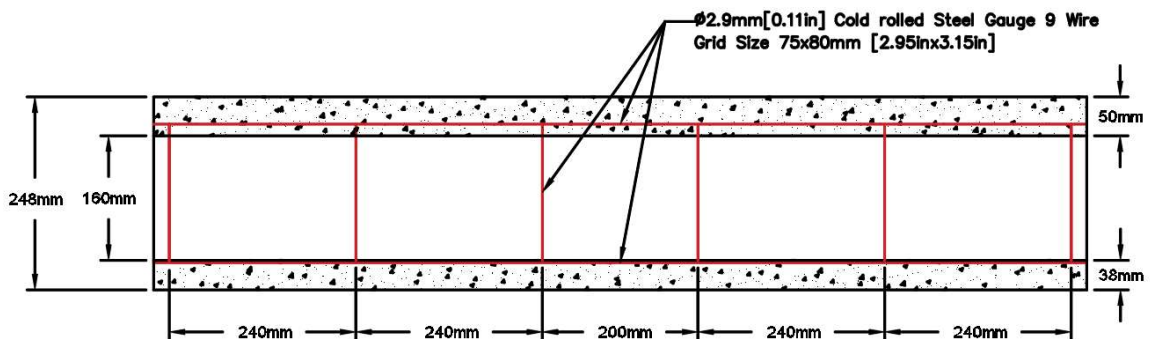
"Parallel-CSP" Side View and Dimensions tested at UCI
